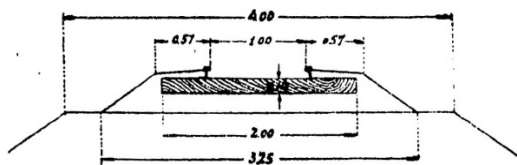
Section of the railway track in embankments (Mendizábal, 1926)
